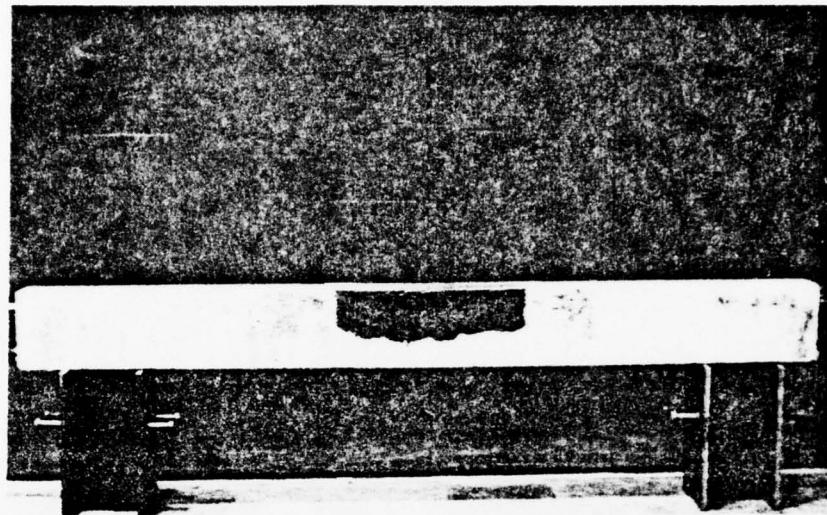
Test Beam (Tension Side Up) Showing Epoxy Concrete Block Cast Around Lap Splices.
